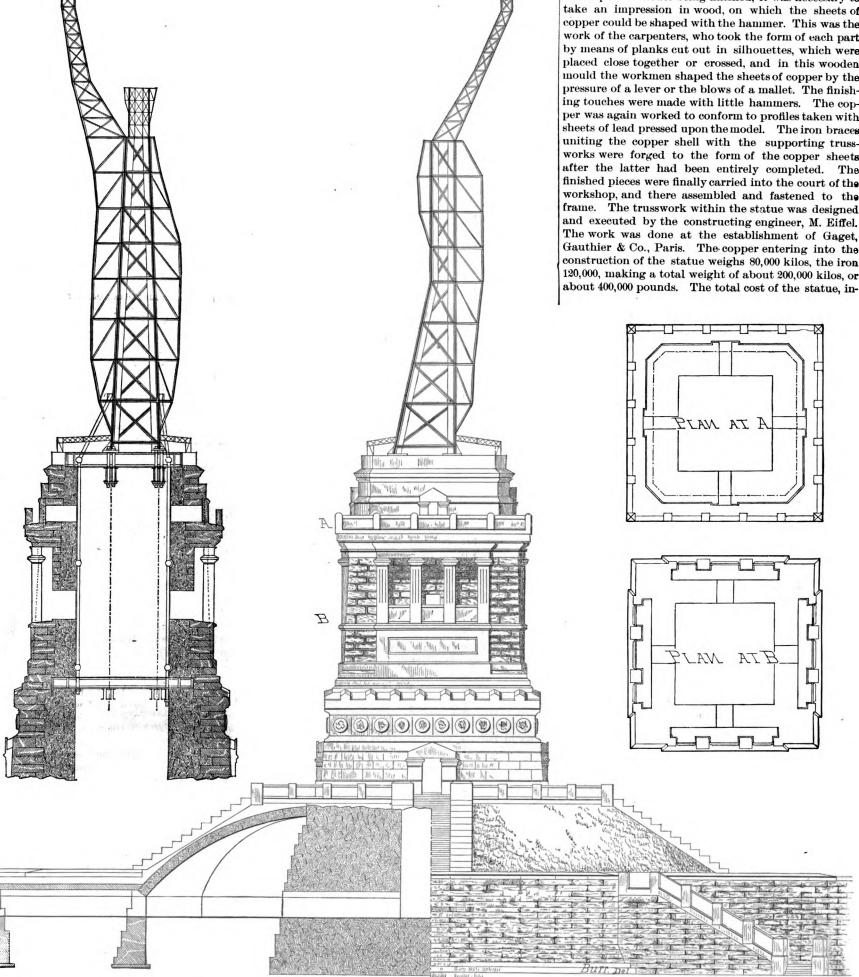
ELEVATION, PLANS, AND SECTIONS OF PEDESTAL, SHOWING METHOD OF ANCHORING THE STATUE.
